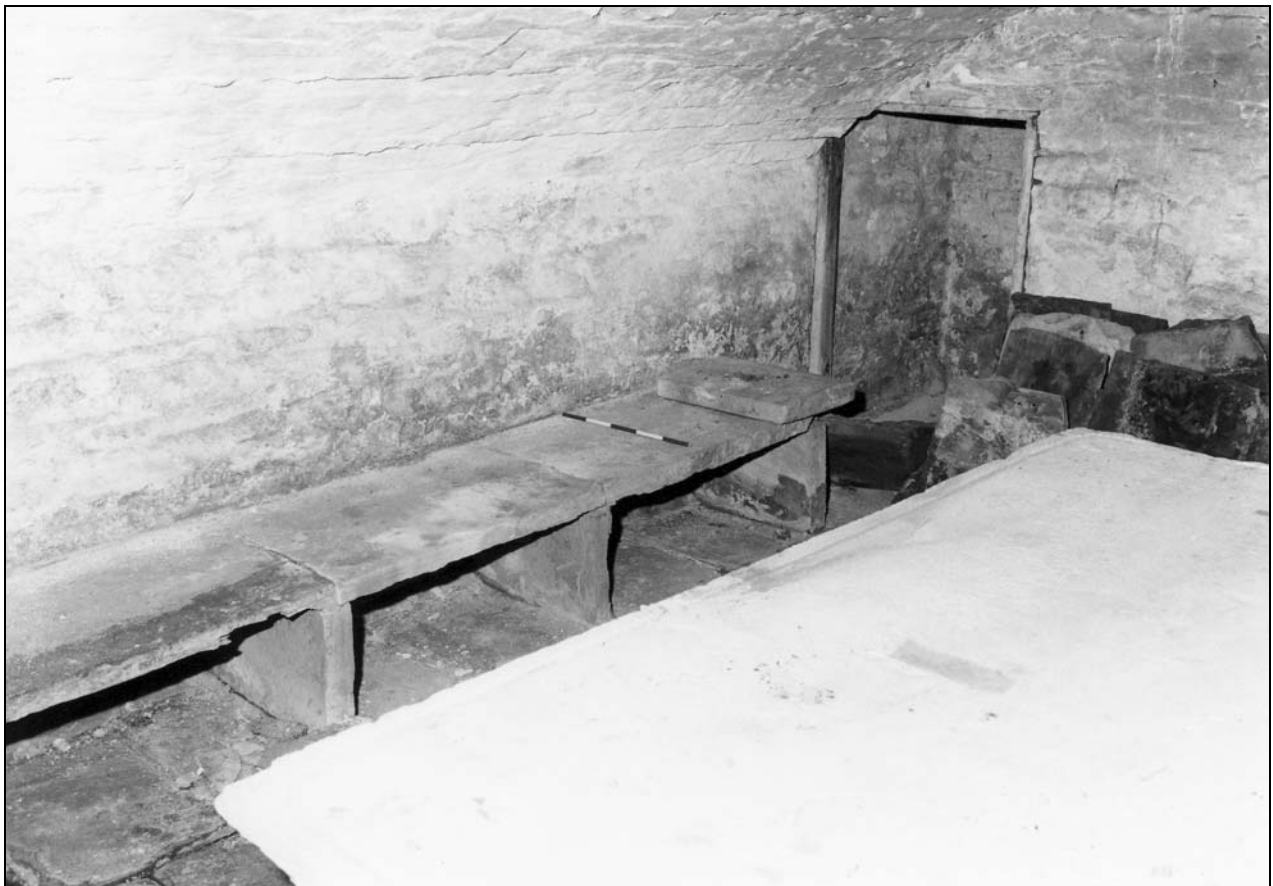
North wing: stone shelving in cellar B01, from the north-west (film 1, frame 17)
